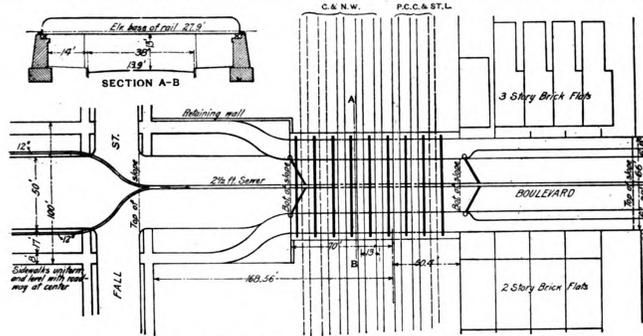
Street Plan of Subway—Washington Boulevard.
